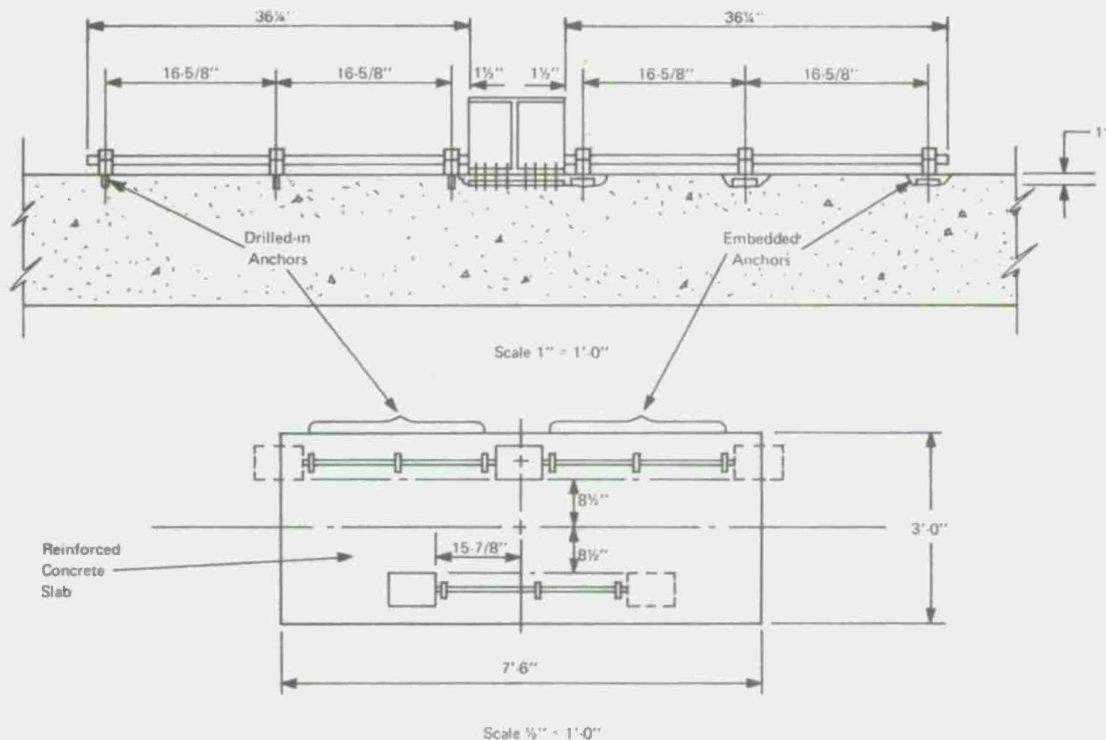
TEST ARRANGEMENT FOR SMALL-SCALE BLAST TESTS—SPRAY NOZZLE PROTECTIVE SHIELD DESIGN
